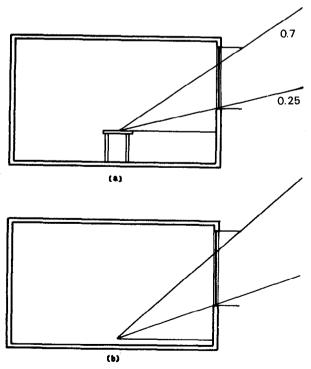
Illustration Depicting Use of Protractors on (a) Sectional Elevation and (b) Plan of a Room for a Window with Louvres (Example 15)
